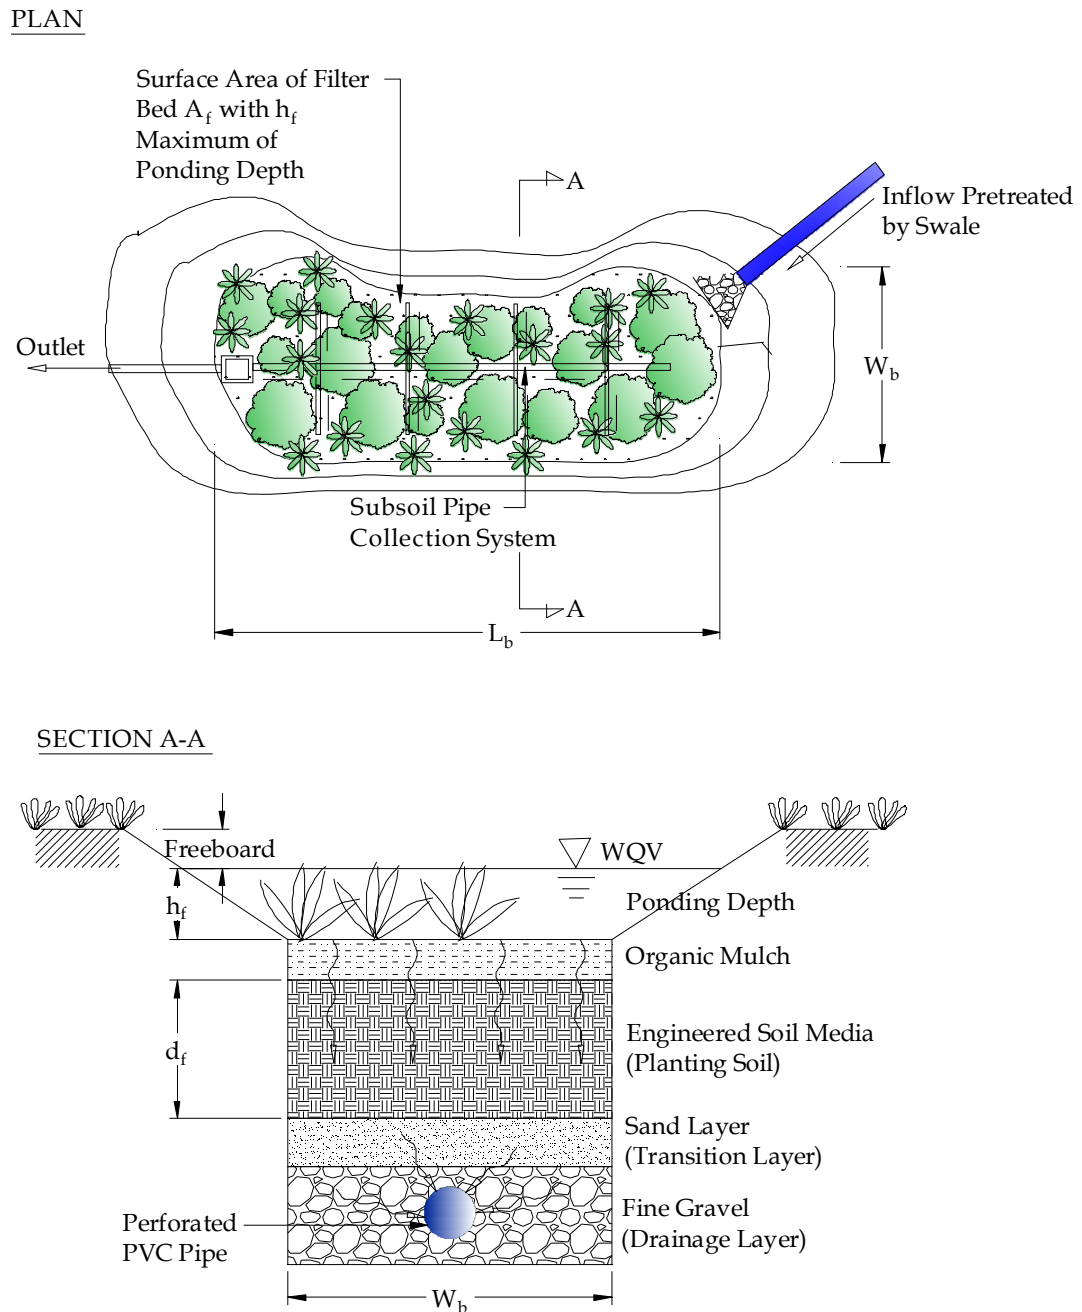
Hydraulic Variables for Subsoil Drainage
